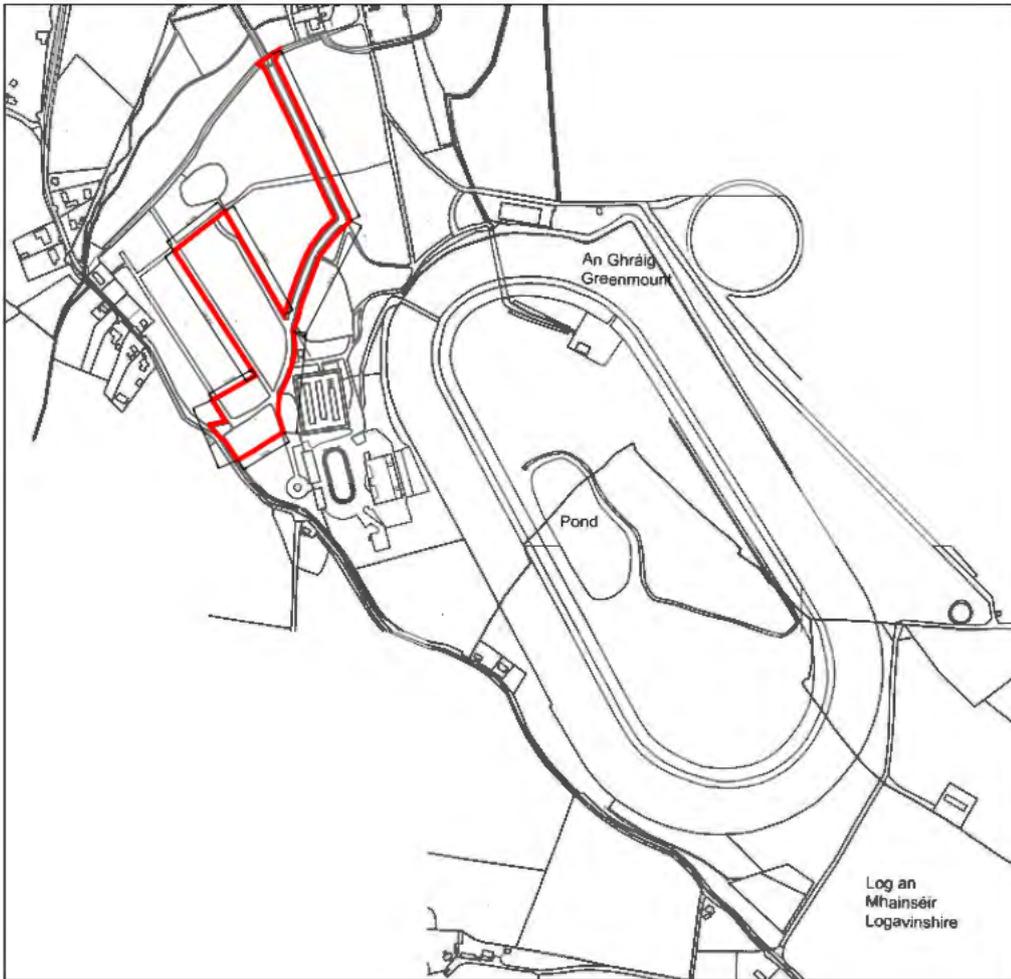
Site Location (Source: Jacobs Engineering, Dec 2025)
